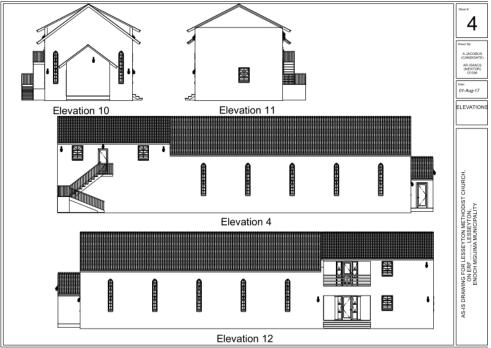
Building Plans for Lesseyton Church Depicting Storeys
